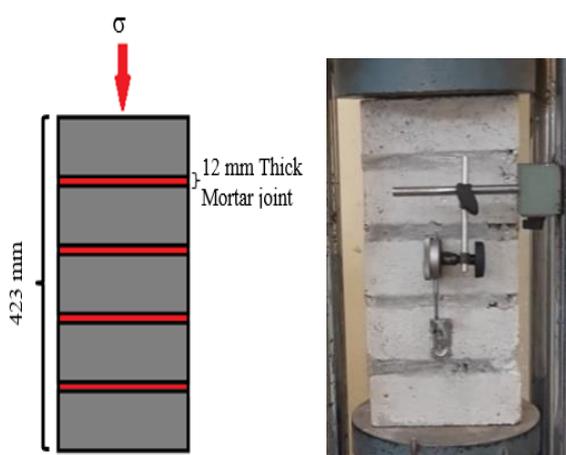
Stack bonded prism of schematic and testing arrangement.
